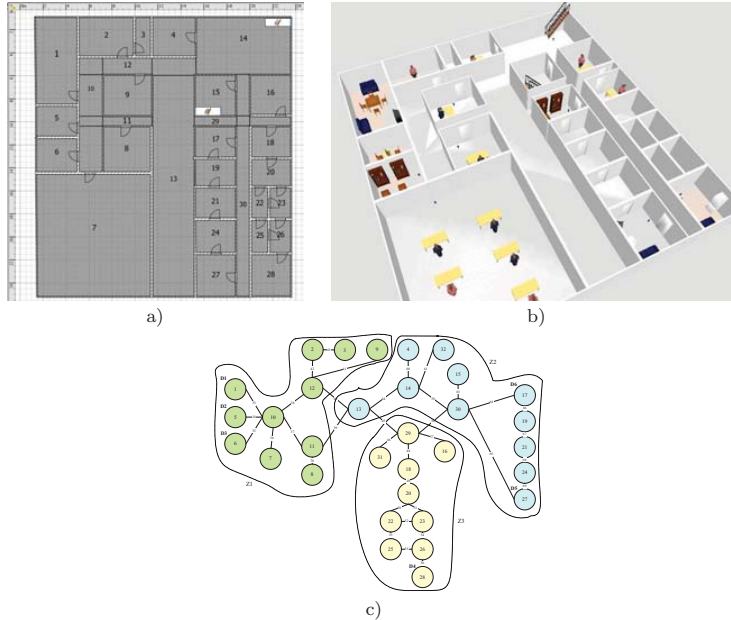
a) Office floor in 2D. b) Office floor in 3D. c) Graph of the floor
